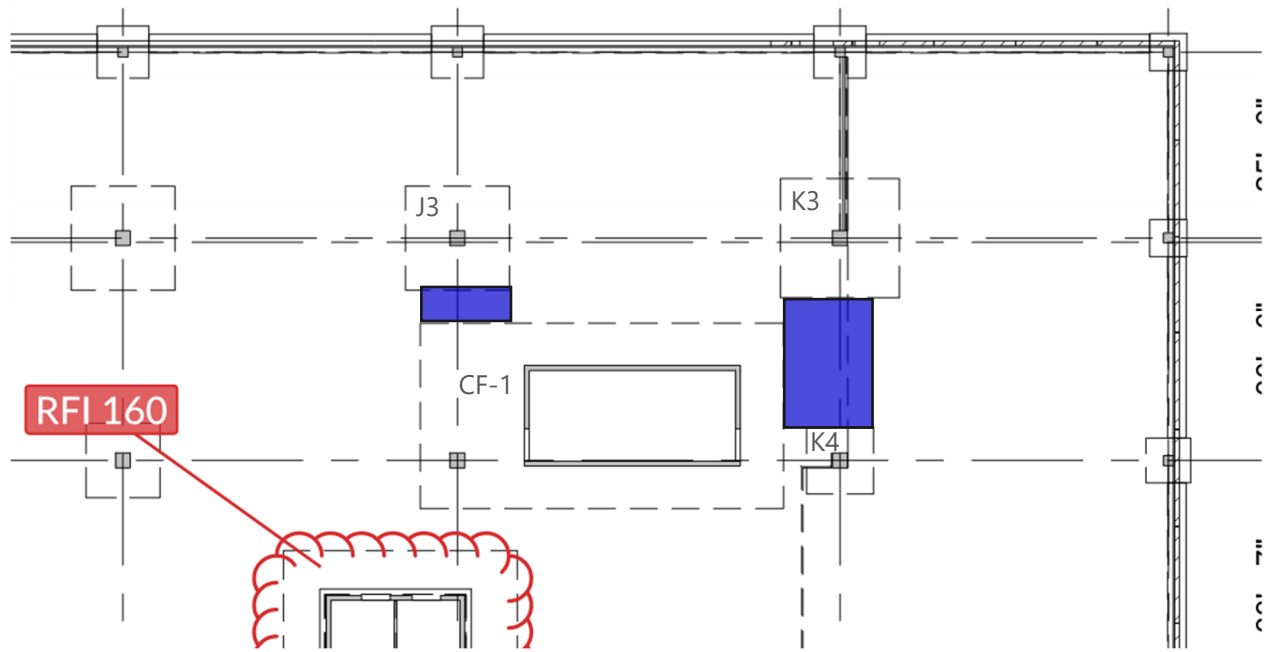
Conceptual rectification of sliding deficiency of mat footing CF-1. The mat footing is attached to nearby isolated footings (J3, K3, and K4) with new reinforced concrete (shown in blue font)
